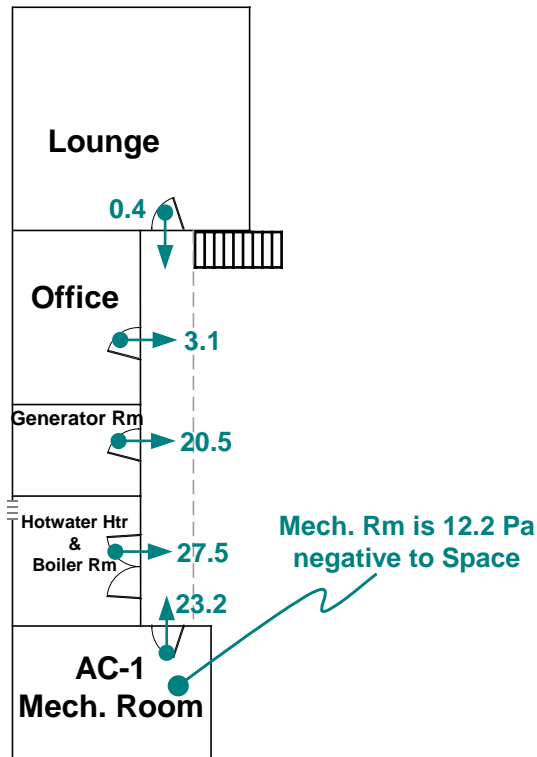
Second Floor Room-to-Corridor Pressures with Building Depressurized to 20 Pa
